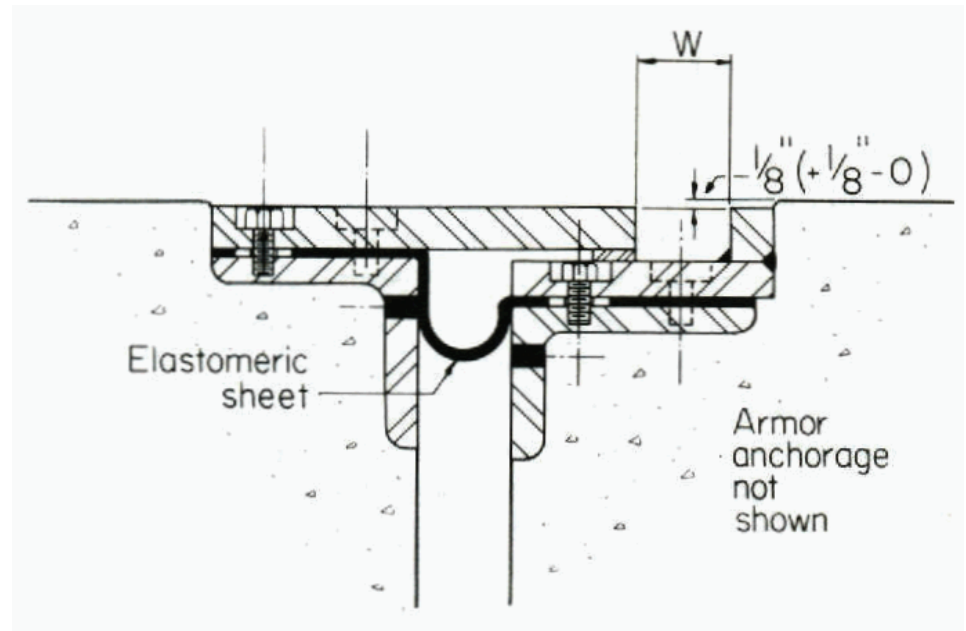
Cross Section of a Sliding Plate Joint
